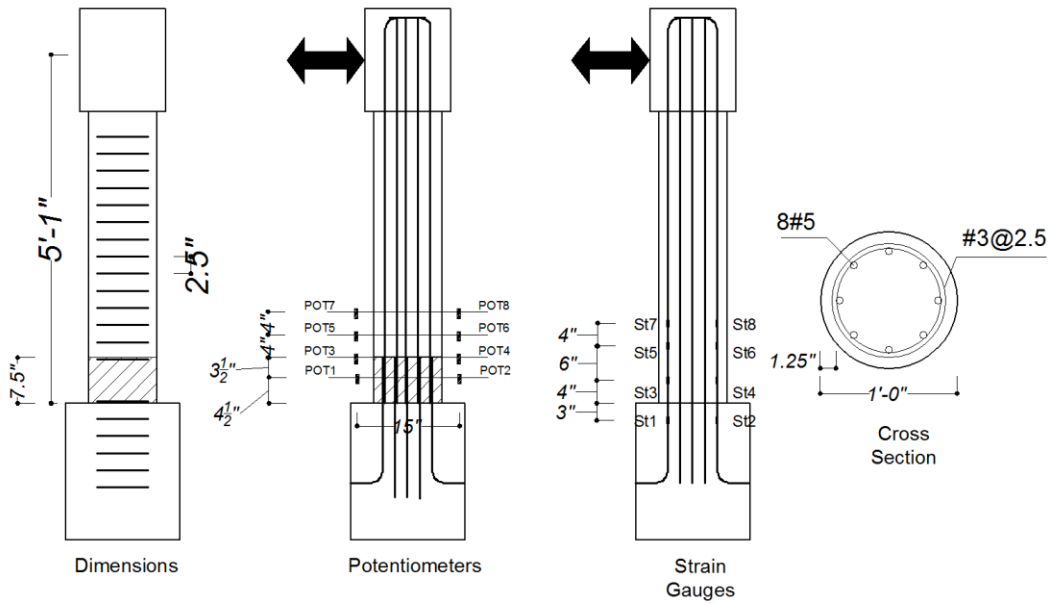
Specimen S-5-12 details, dimensions, reinforcement and installed measurement tools. (No stirrups at splice region).
